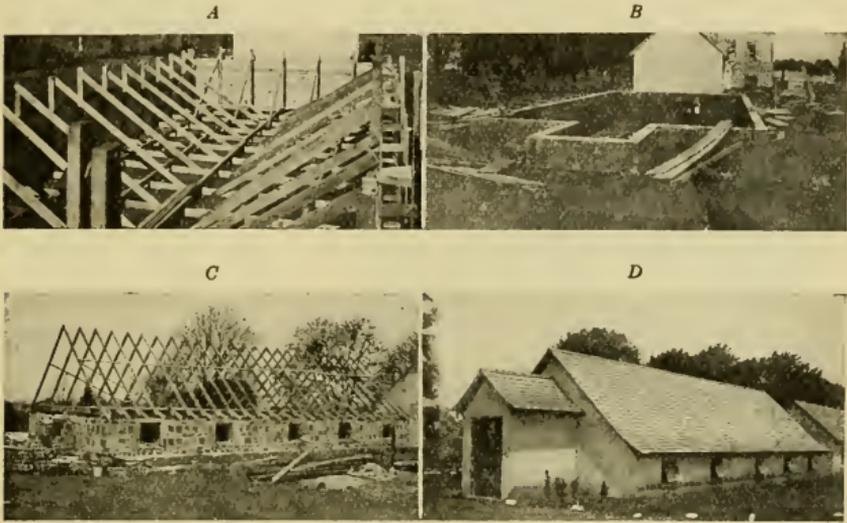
Four views showing construction of hollow-tile incubator cellar. A, Forms ready for pouring concrete foundation wall; B, forms removed; C, hollow-tile construction and manner of framing roof; D, completed cellar.
